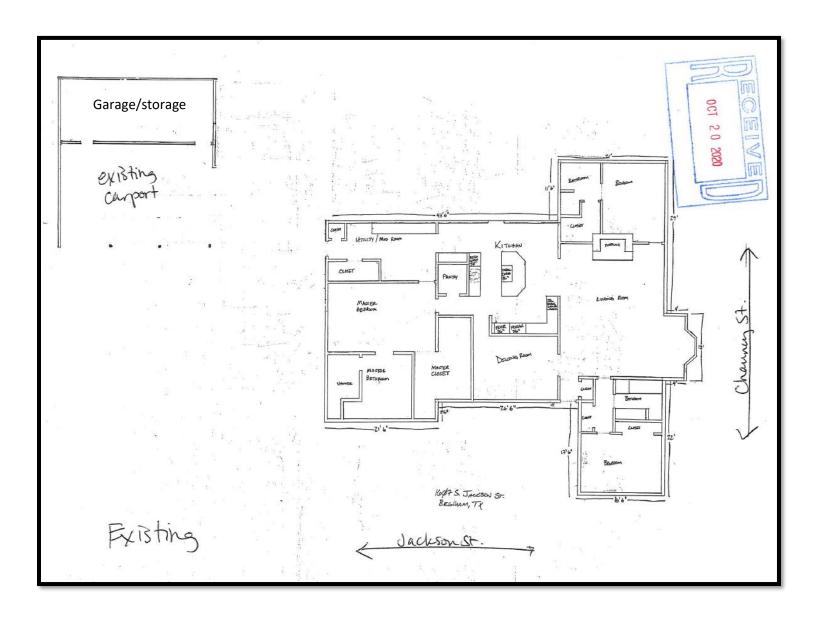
EXHIBIT "F" PROPOSED ADDITION/FOOTPRINT
